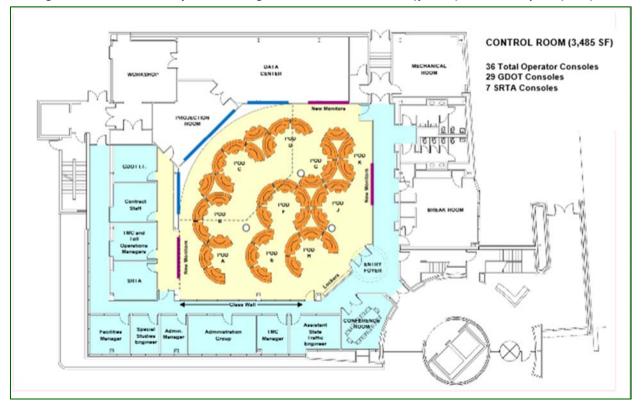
GDOT TMC Layout including remodeled control room (yellow) and office space (blue)
